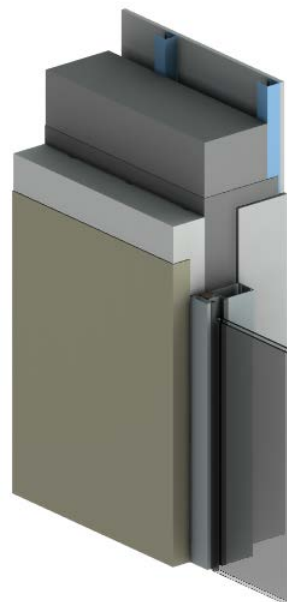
EIFS Concrete Wall to Curtain Wall Transition
